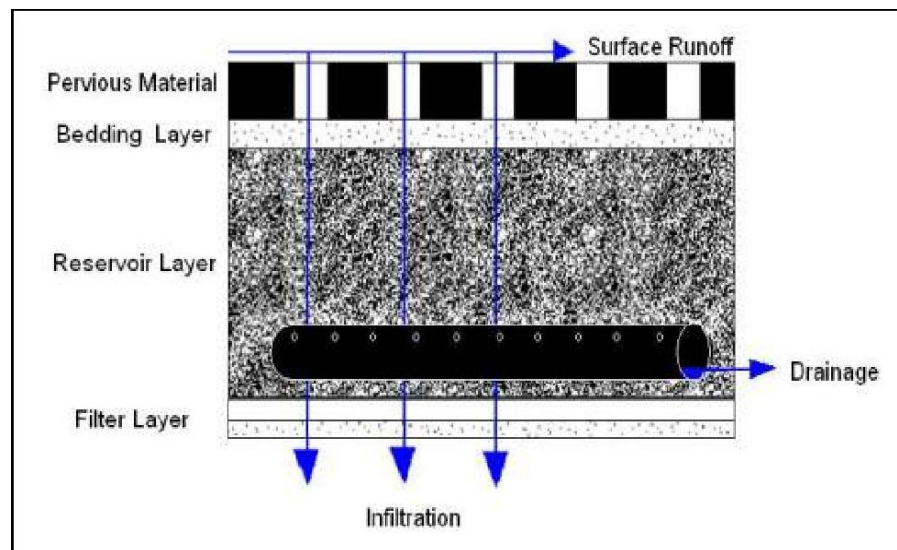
Cross Section of Typical Permeable Pavement (Source: Hunt & Collins, 2008)
